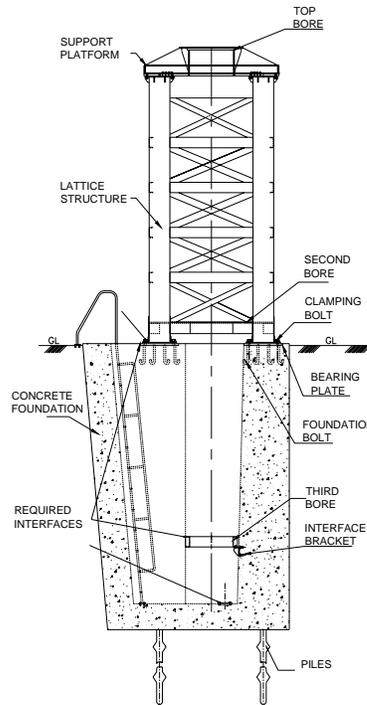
TOWER STRUCTURE WITH CONCRETE FOUNDATION
